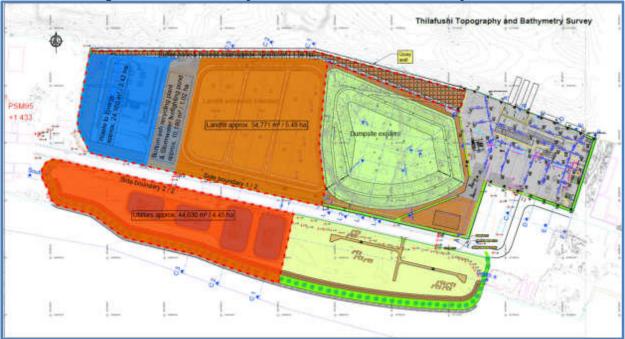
Indicative Layout of WTE Plant and Ancillary Facilities
